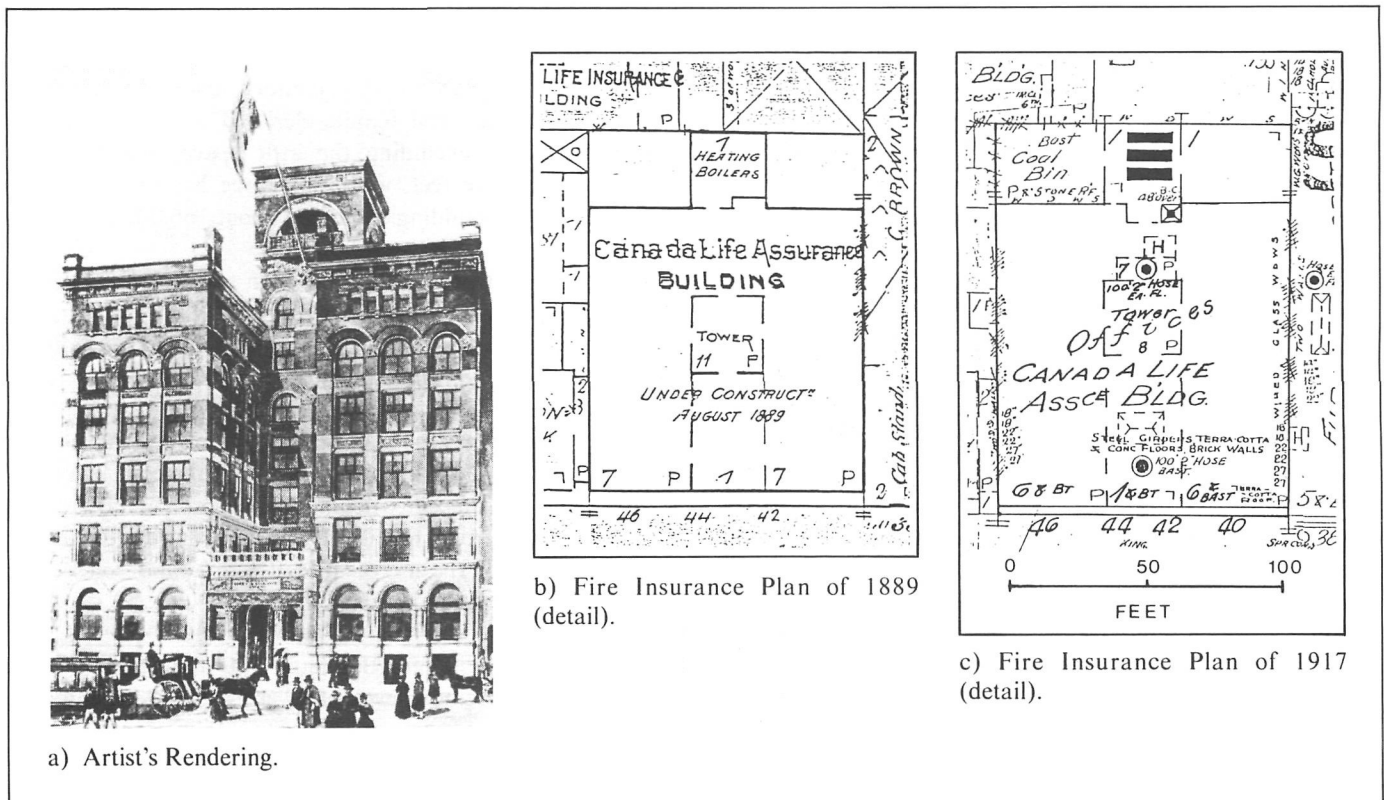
Canada Life Building of 1889-90, King Street West, Toronto.
